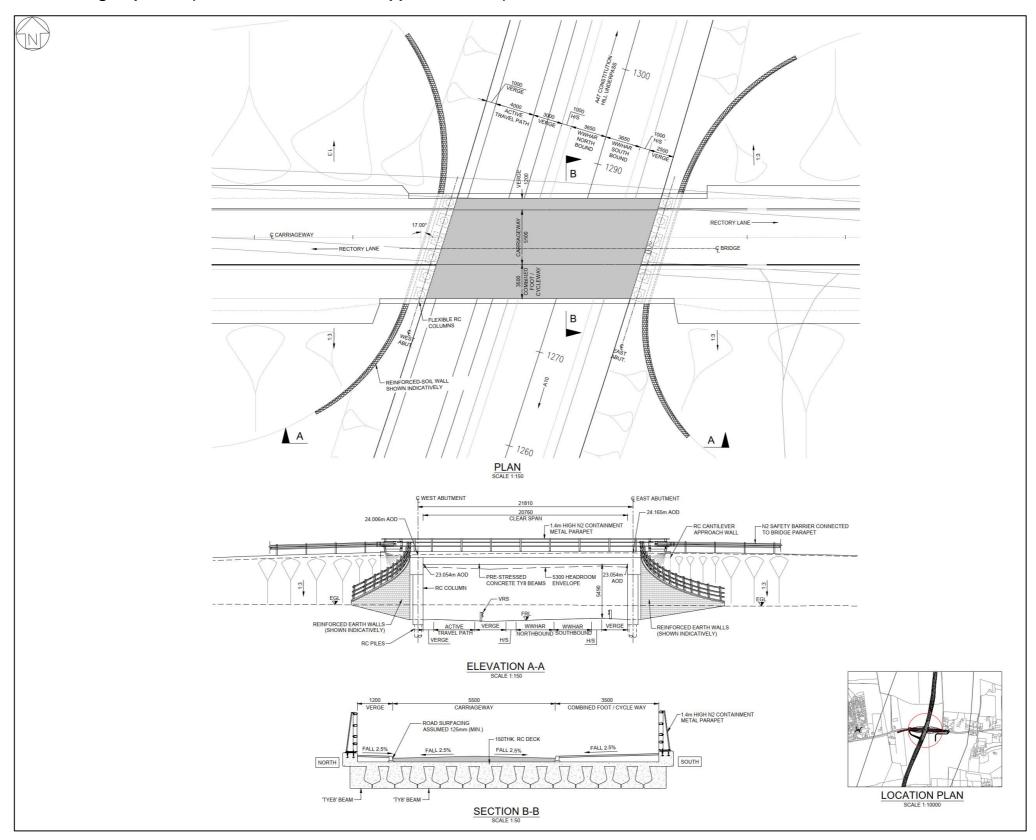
Rectory Lane Overbridge Option 2 (Solid Concrete End Support)
